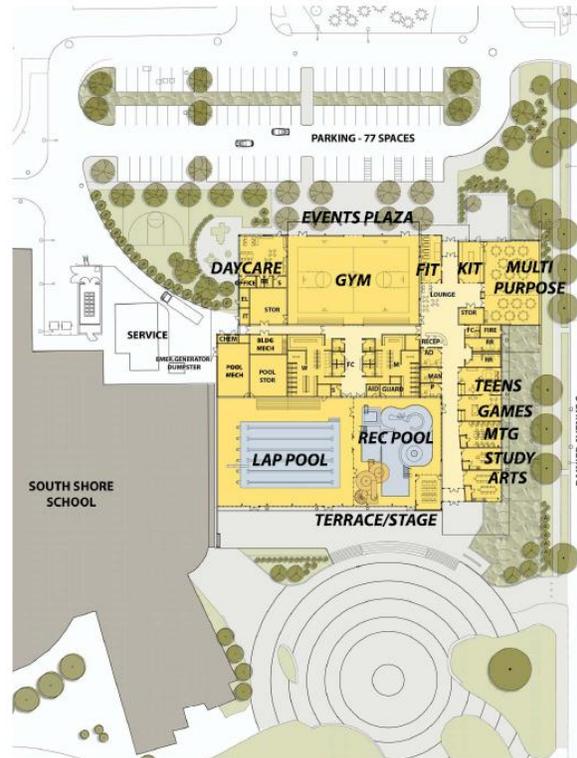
Rainier Beach Community Center & Pool plans and renderings
